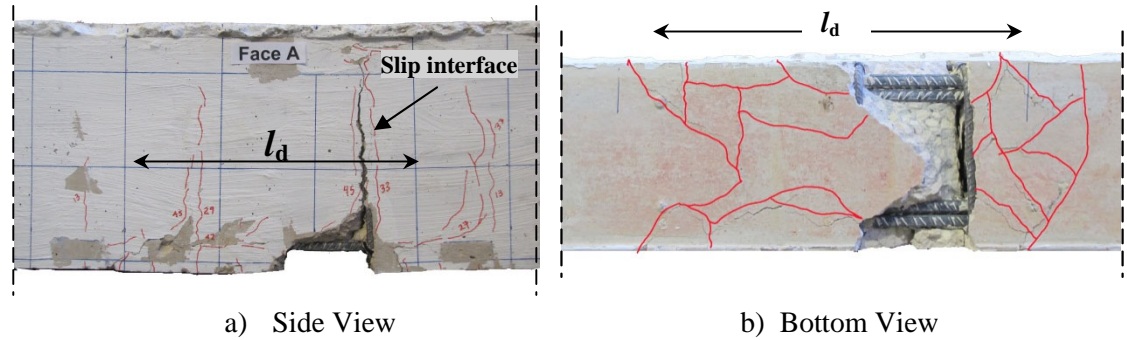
Typical splitting cracking at failure of the internally confined specimens, LC10-D12-S
